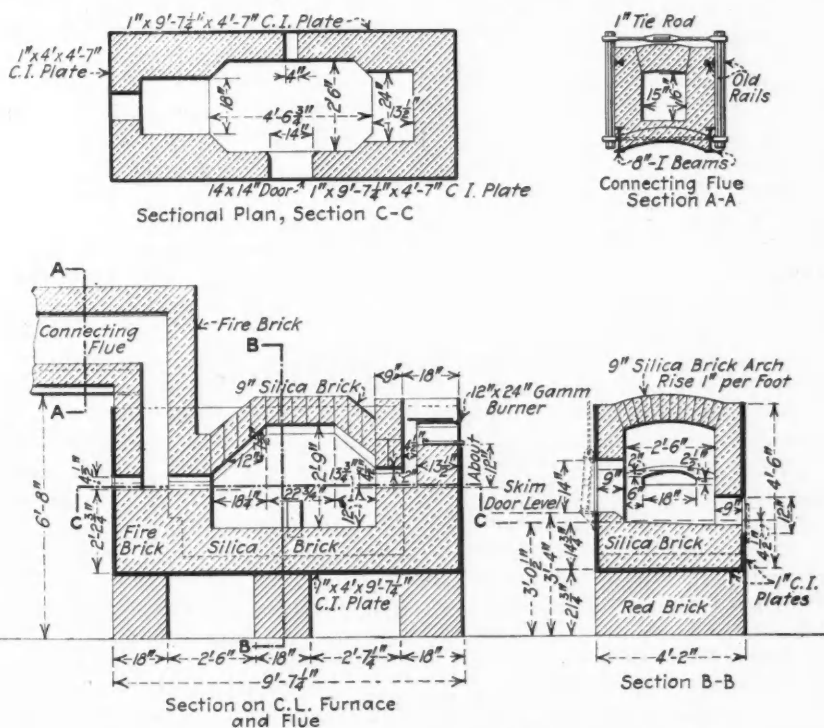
DETAILS OF FURNACE CONSTRUCTION
